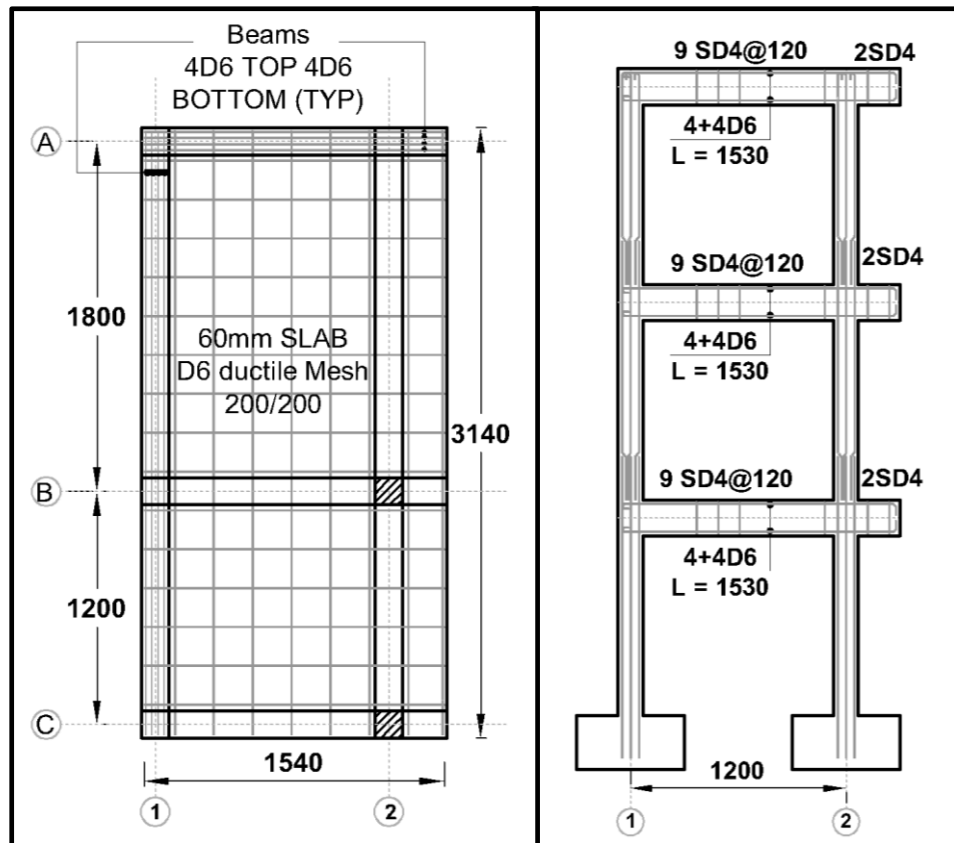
Slab and reinforcement details: axes A, B and C.
